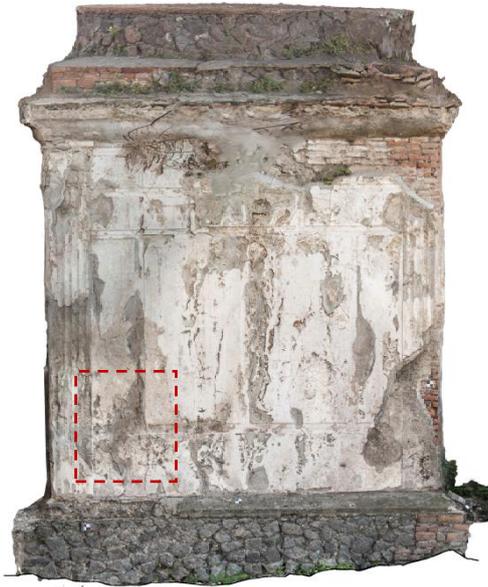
Plaster cracks (PN\_EN\_04\_N\_IMG\_4293).
